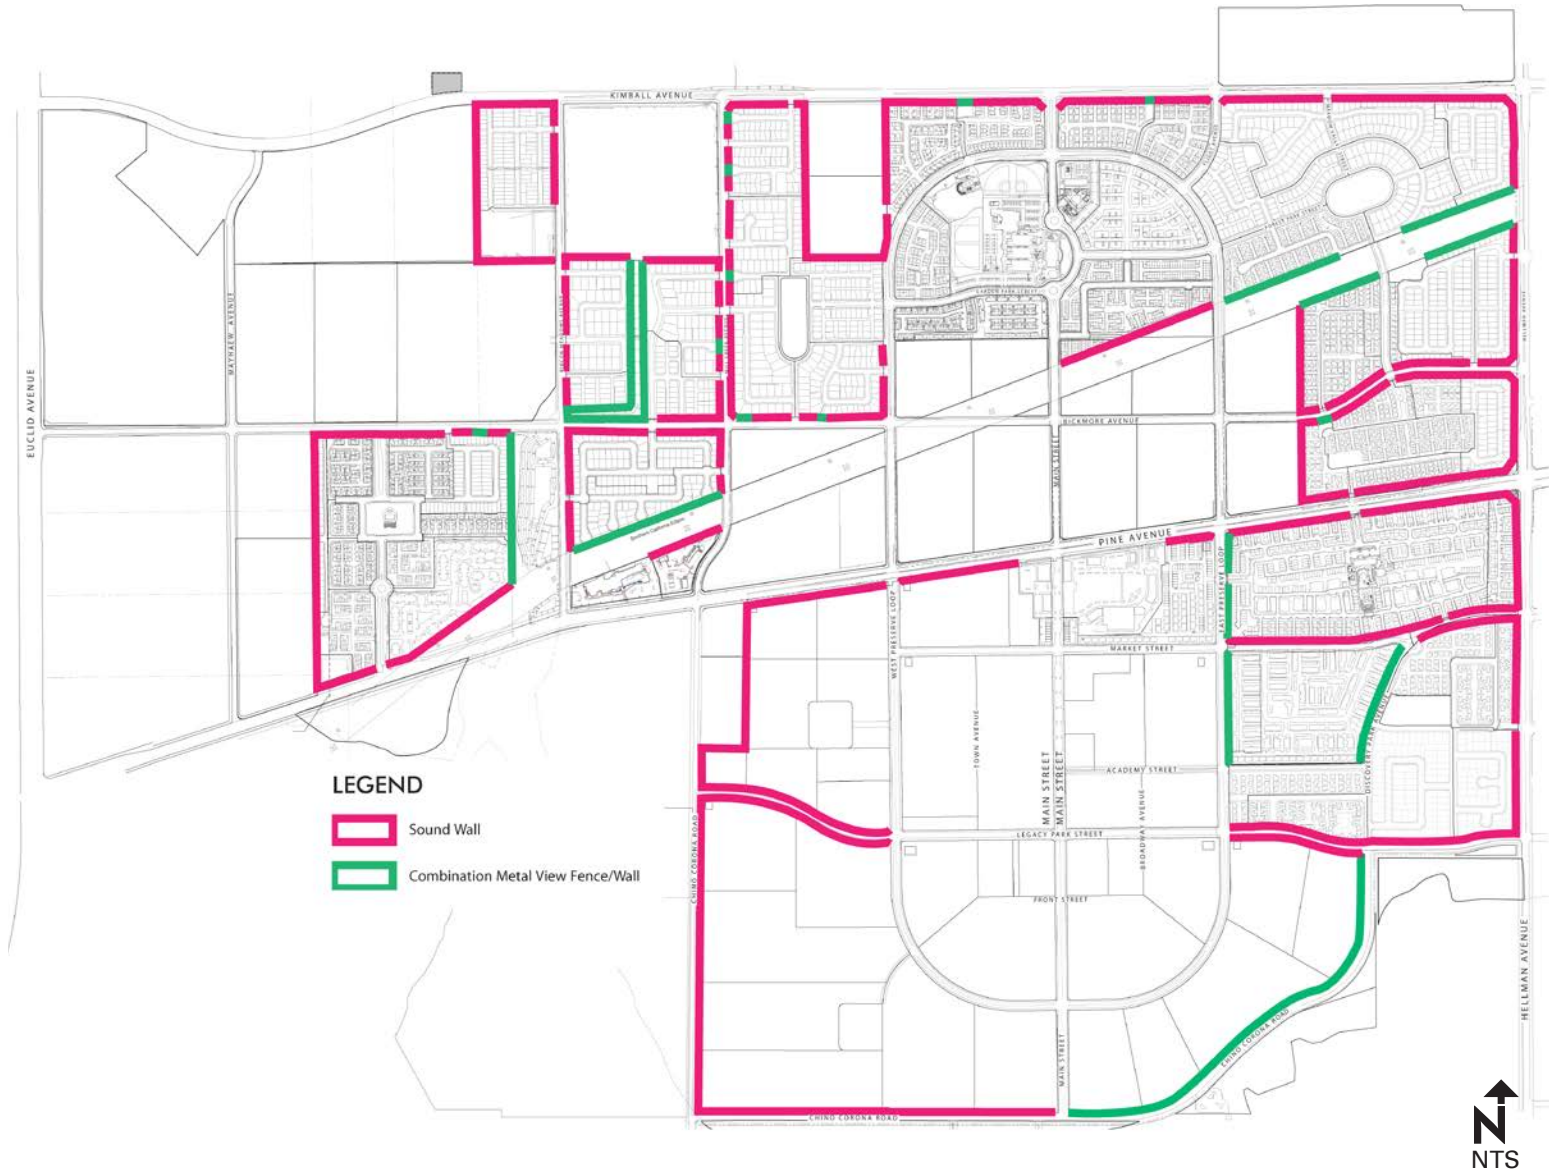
NEIGHBORHOOD FENCE AND WALLS PLAN
